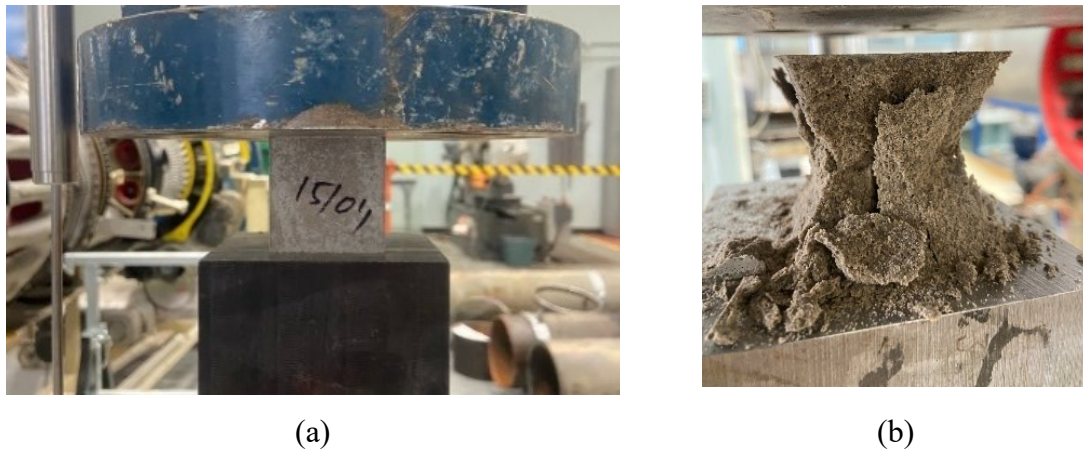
(a) Compressive-strength test of cubic specimen and (b) failed mortar specimen.
